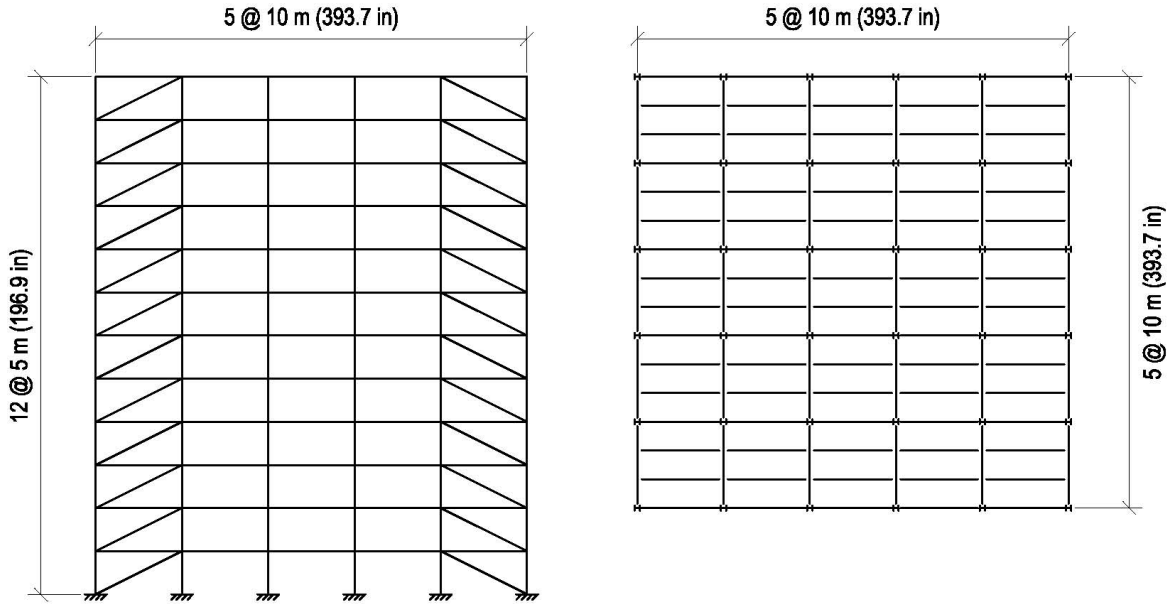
Elevation and plan of the structure used in the MDOF case study.
